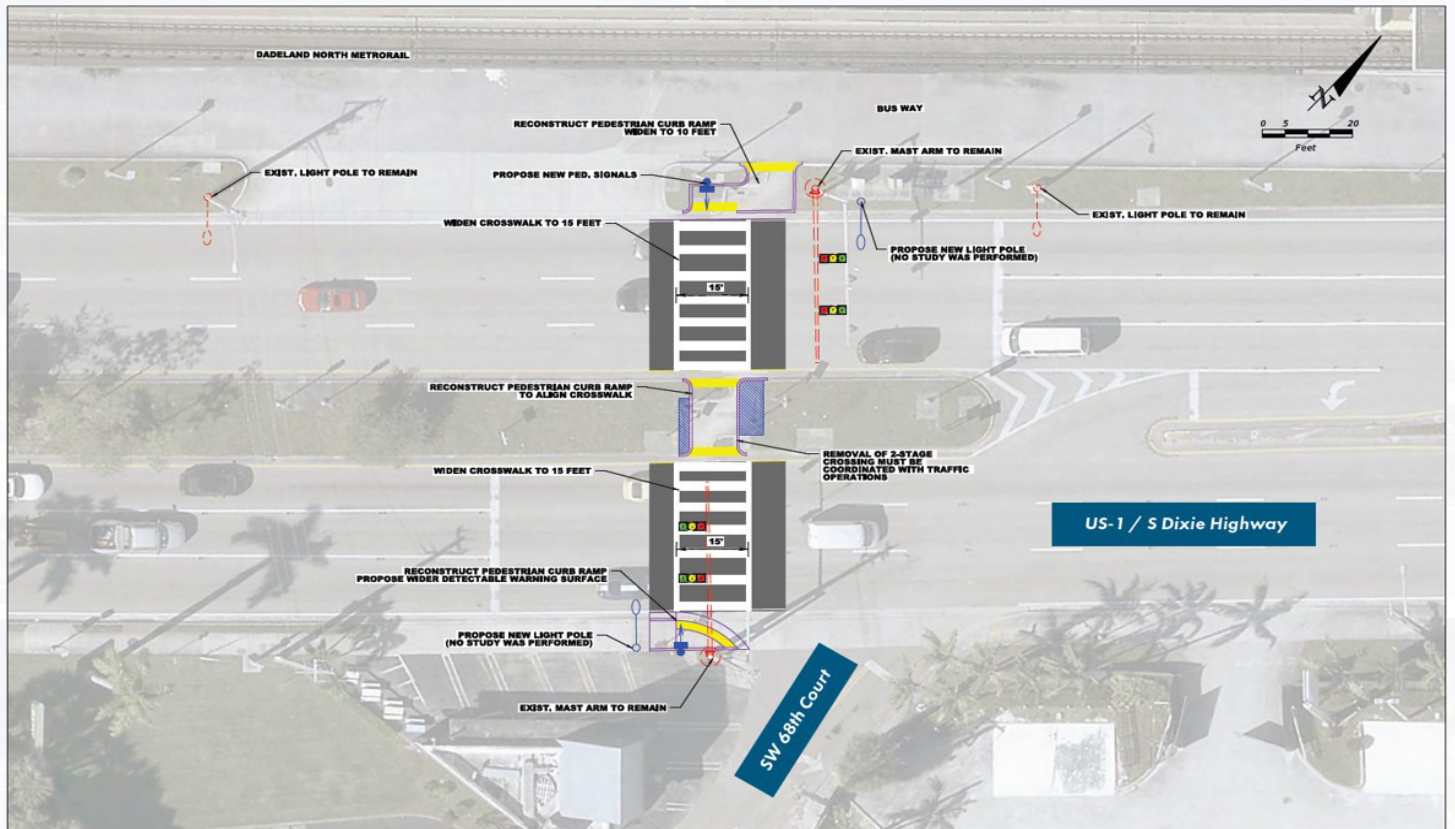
Dadeland North Metrorail Station Alternative 4: At-Grade Improvements at SW 68th Street
